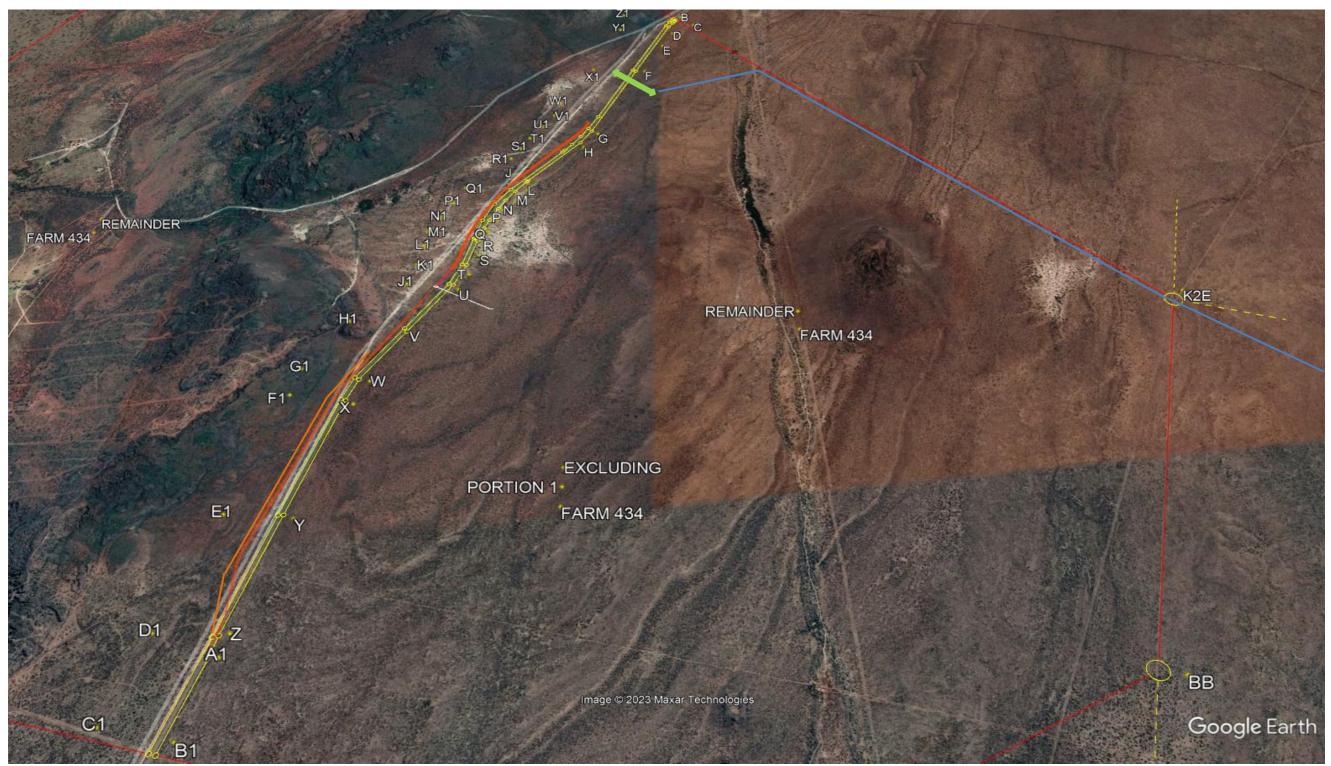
Conceptual site layout plan, the private siding is indicated in RED next to the existing TFR line in yellow, the proposed deviation on service road is indicated in ORANGE, the proposed railway crossing is indicated in green and the new access road in Blue.
